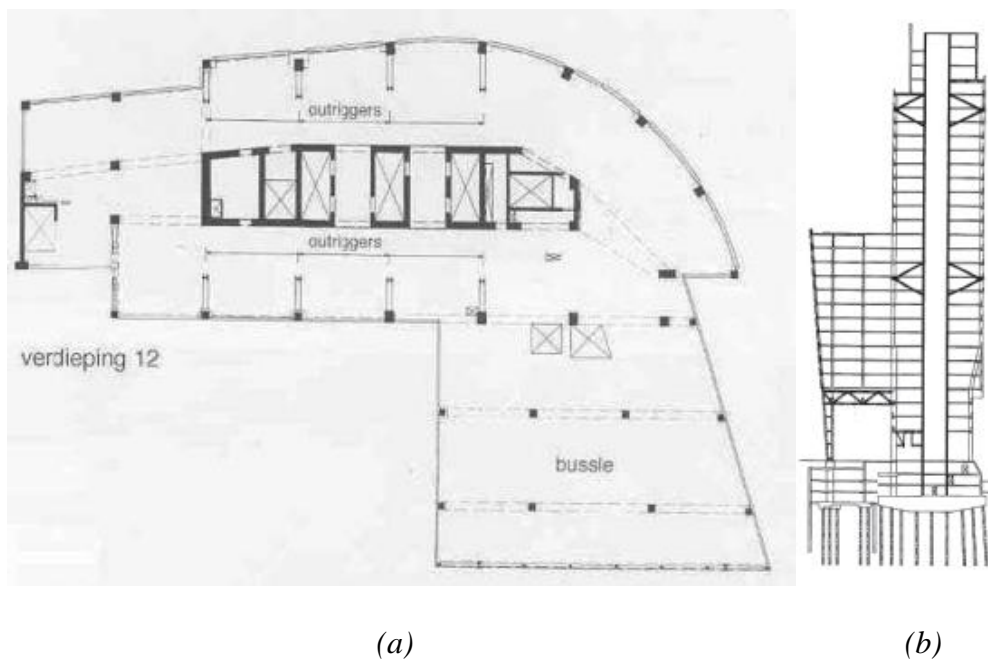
(a): Floor plan Blaak office tower ; (b): Cross section of Blaak office tower. Source: Abspoel [1].
